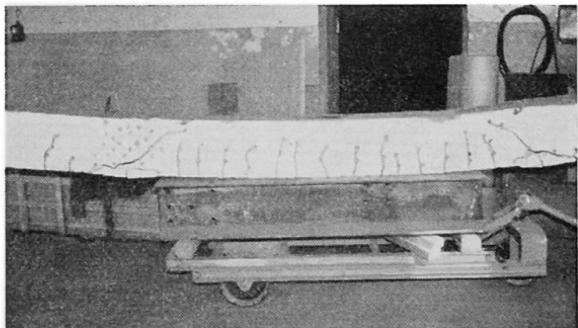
A beam jointed as in Fig. 4 and loaded after failure in order to study the cracks.
